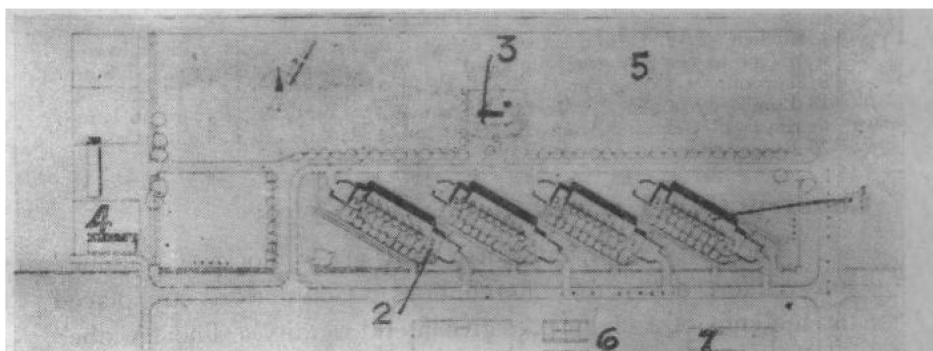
Site plan 1:2000 1 Row houses 2 Garages 3 Community centre
